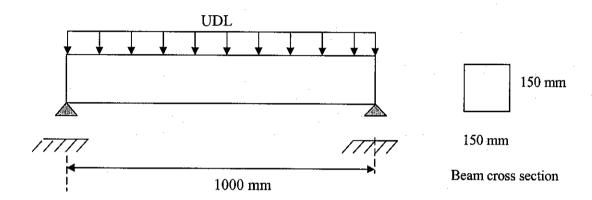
1000 mm concrete beam with Uniformly Distributed Load
